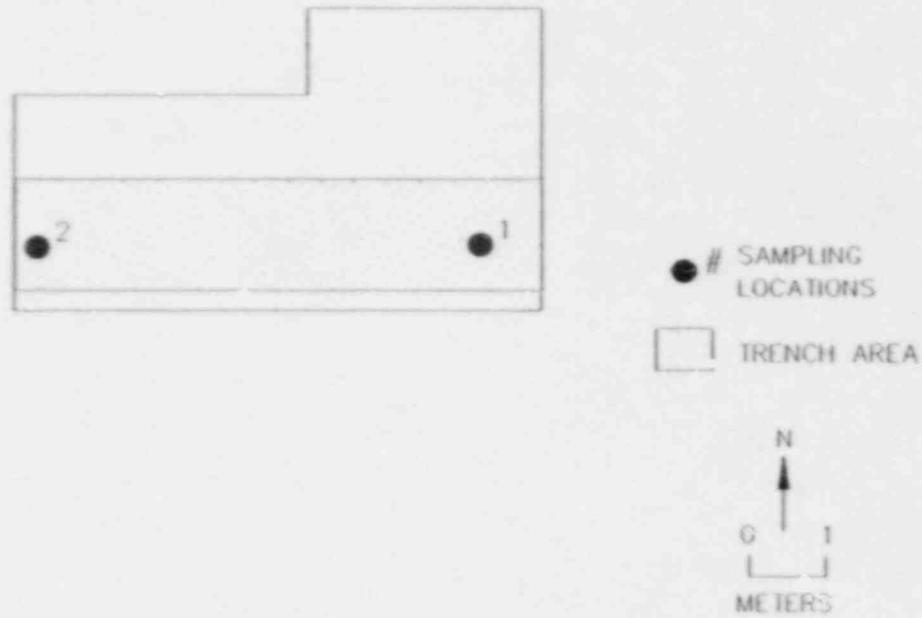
Hallway (Area 16N) Showing Trench Soil Sampling Locations
